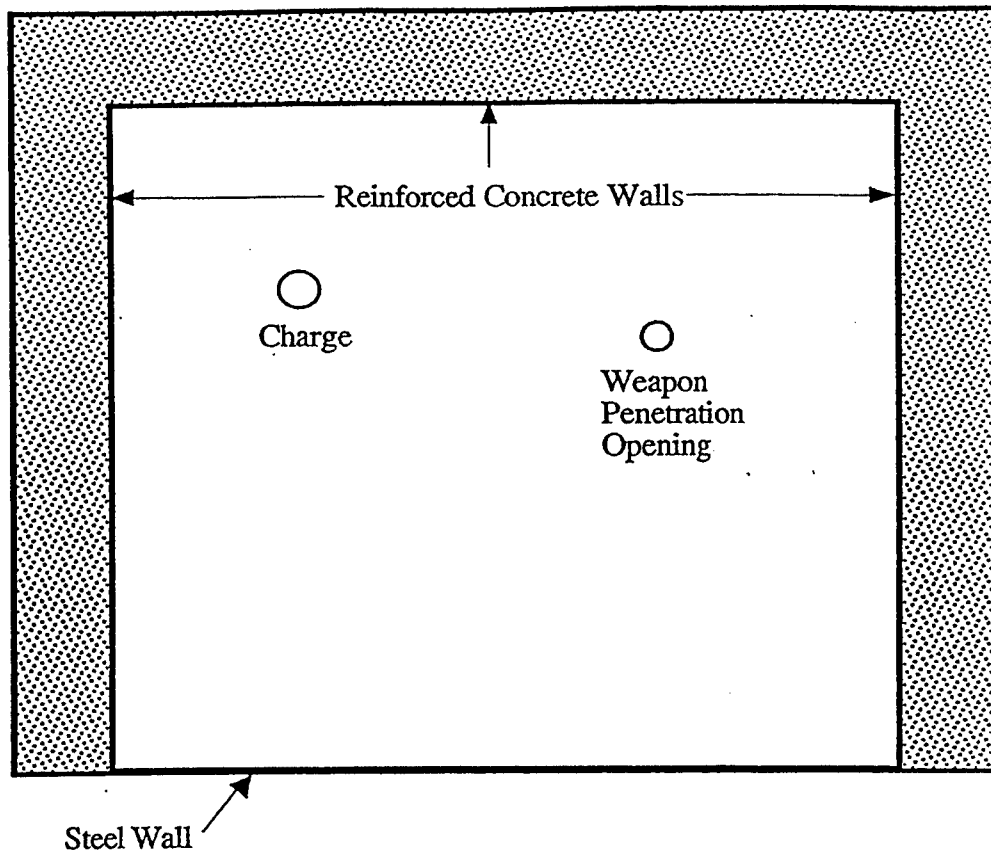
Floor plan for DIPOLE EAST 159 structure.
